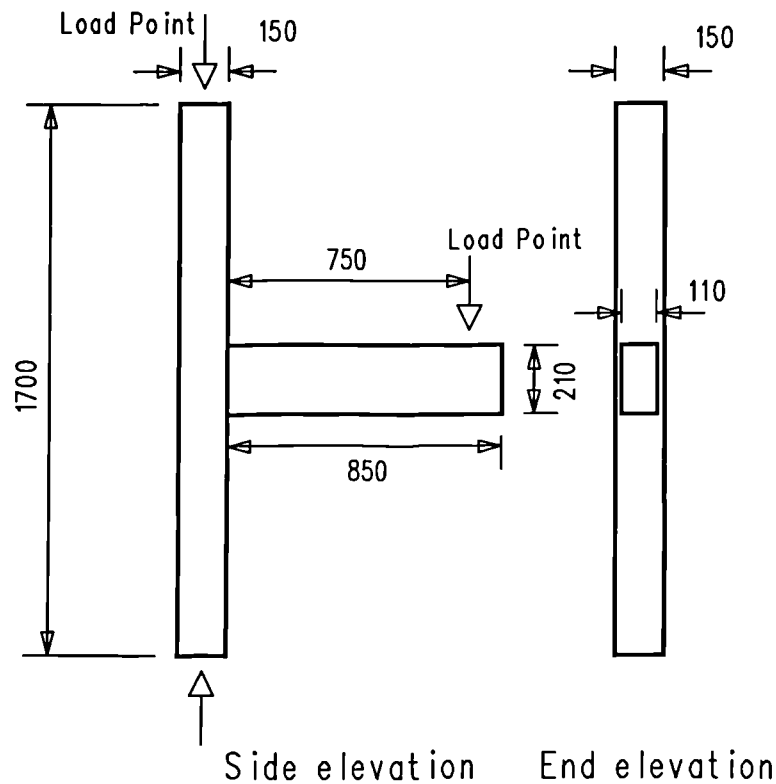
Specimen layout (dimensions in mm) - Scott [8]
